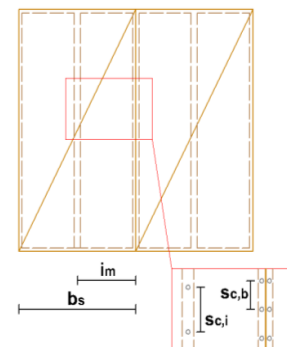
Dimensions of the sheeting boards and fasteners spacing
